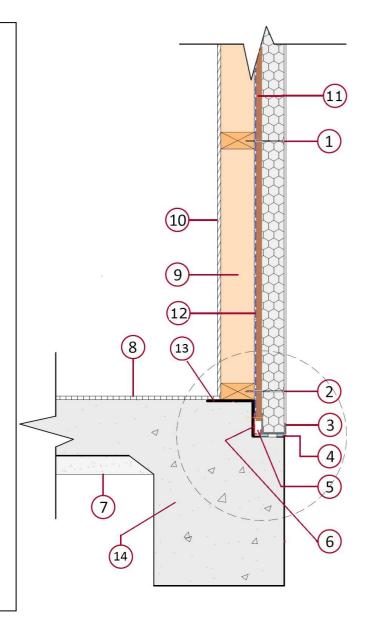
B – PANEL REBATE SLAB DETAILS – SECTION VIEW – Cavity System
